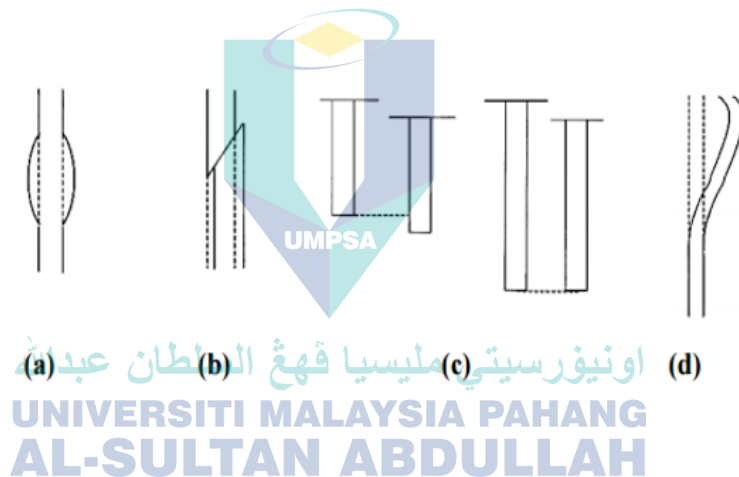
Modes of failure mechanism develop in group of stone columns
